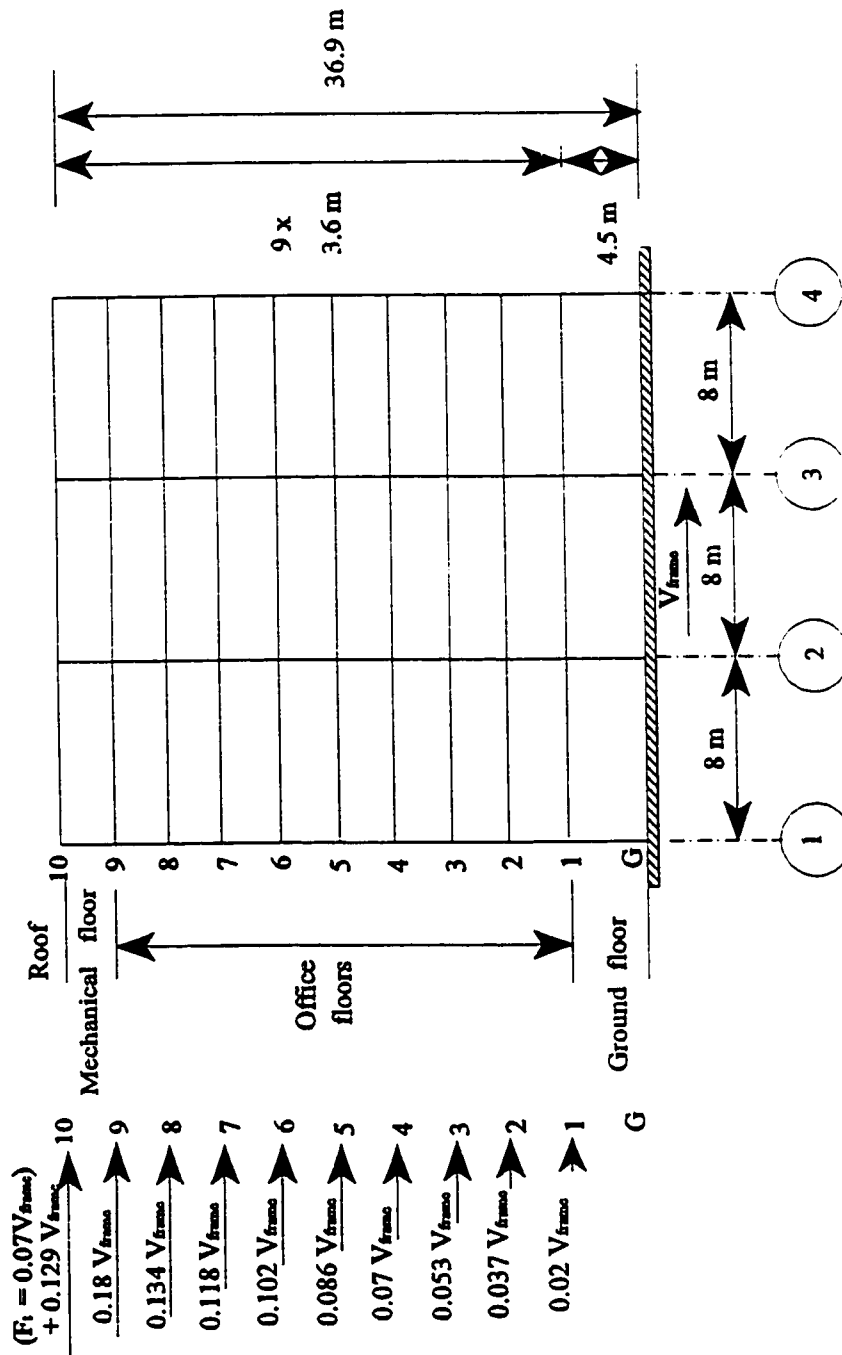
Elevation of the ten storey moment resisting steel frame (column line A).
